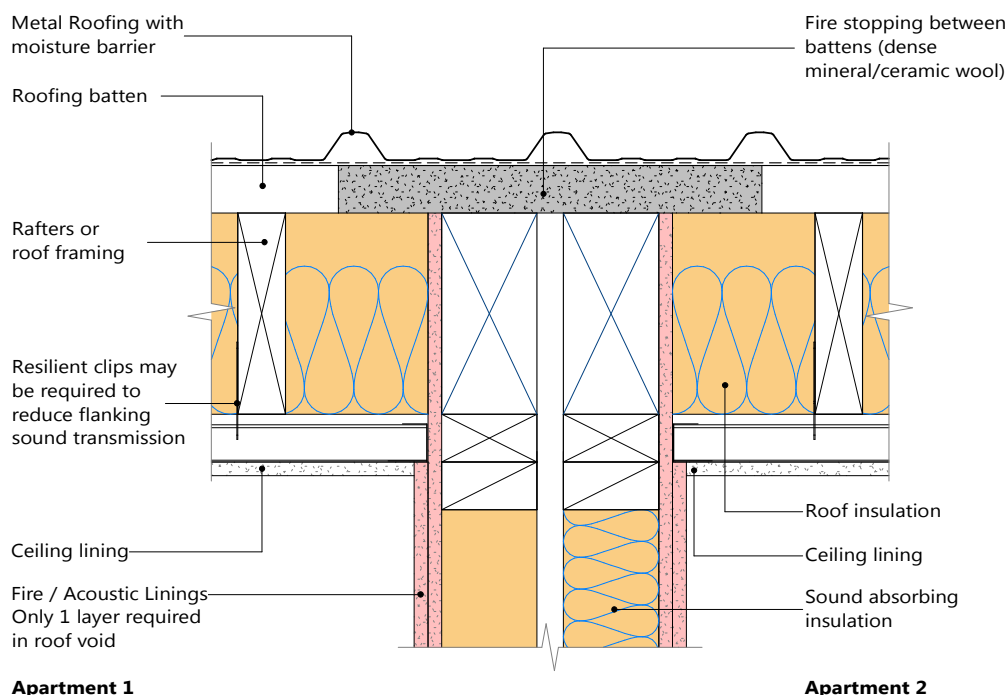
Typical detail for intertenancy wall at underside of roof (wall running parallel to rafters).
